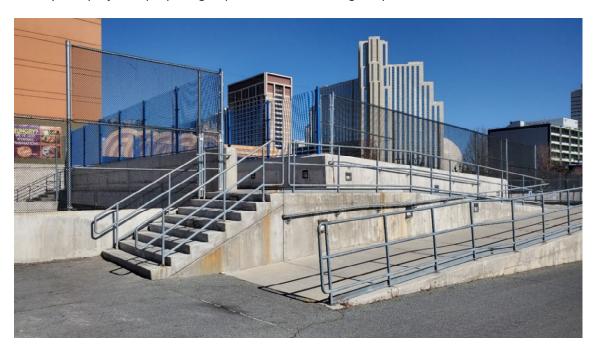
Pedestrian bridge over railroad trench at Lot C
